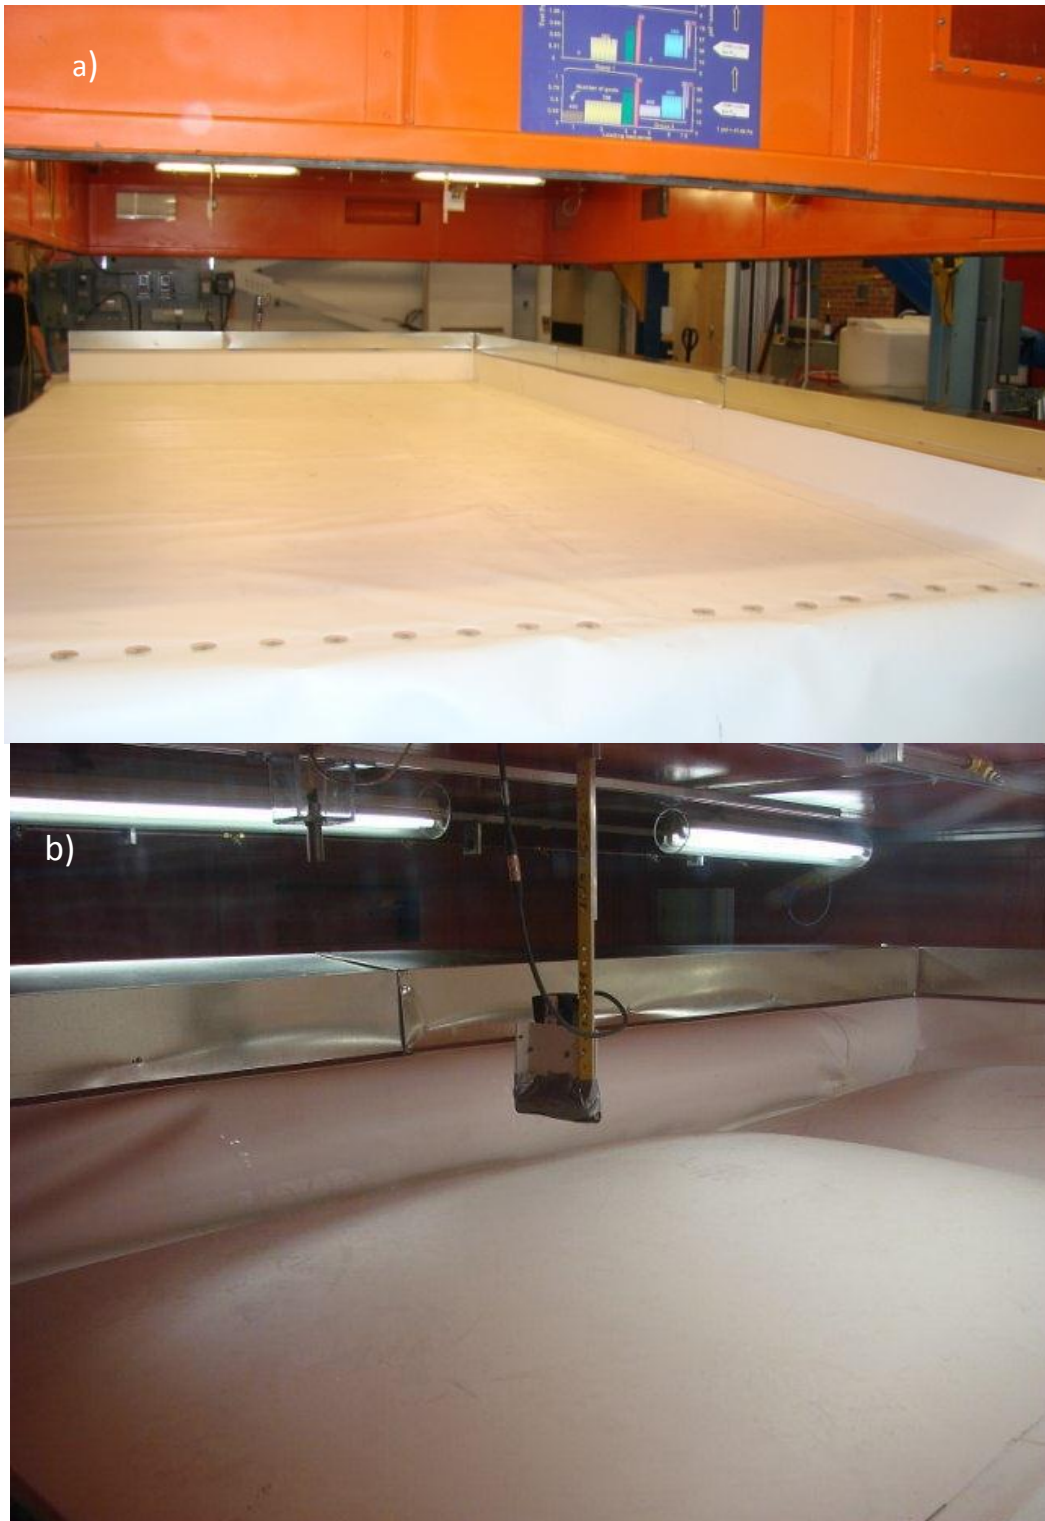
Laboratory testing system for full-scale single ply roofing system mock ups. a) whole system installed, b) close up, from Borzoe (2012)
